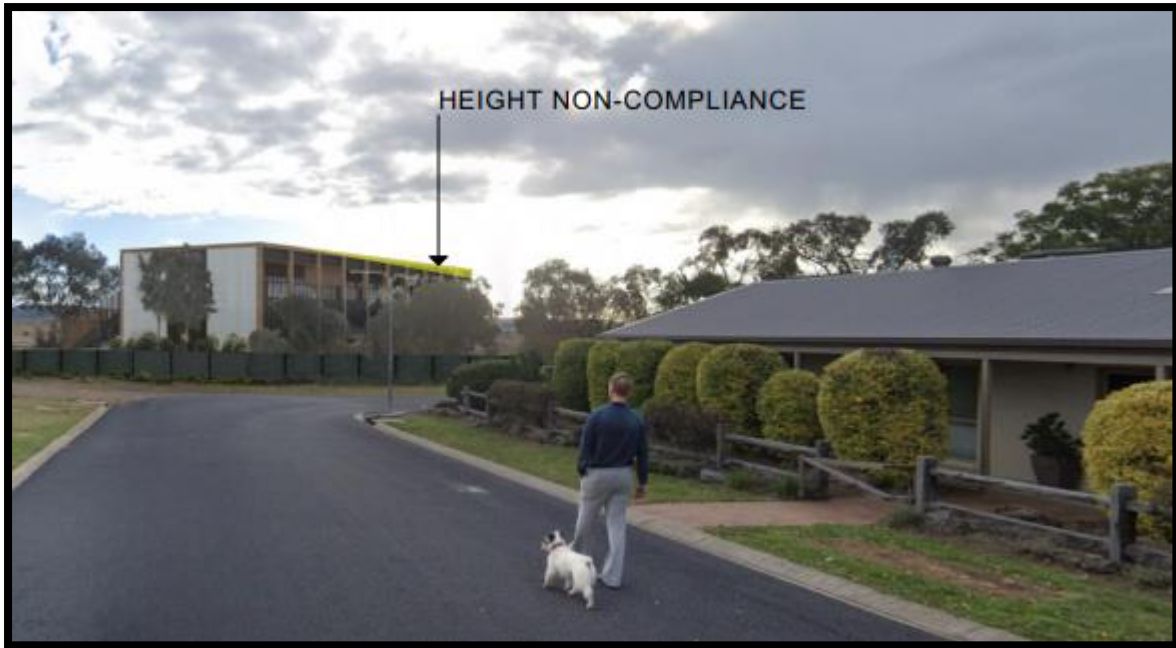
Image of proposed building including height encroachment from Esmond Avenue looking west.
